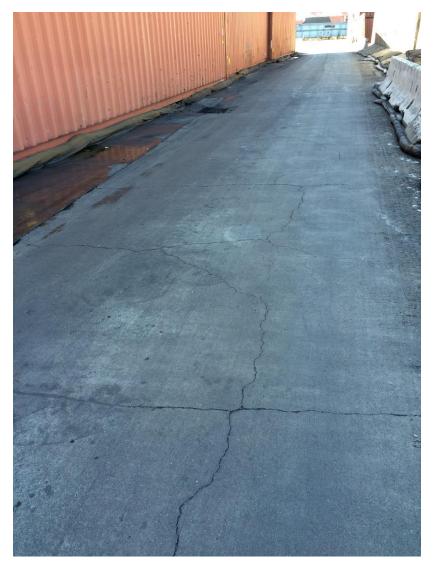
Looking south toward drain inlet 3DI-11A: areas of surficial cracking.
